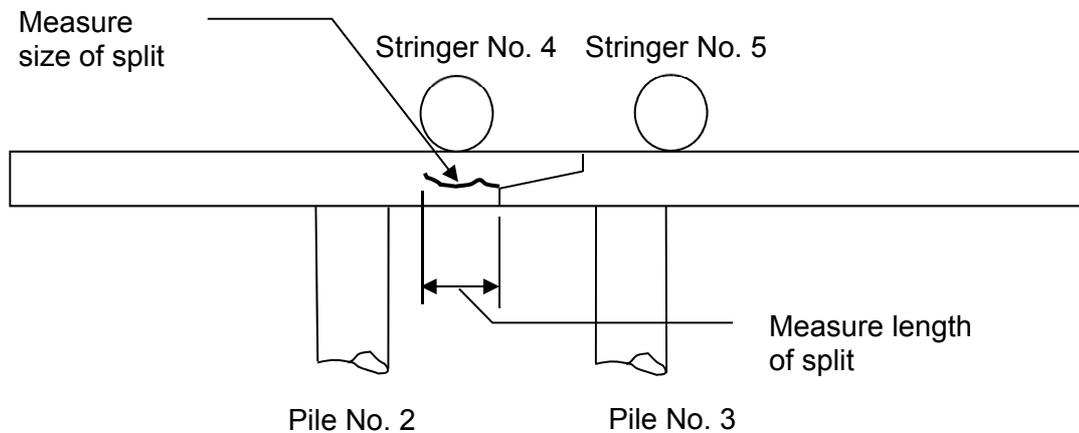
HALFCAP SKETCH EXAMPLE - ELEVATION VIEW (ABUTMENT 1 SIDE)
